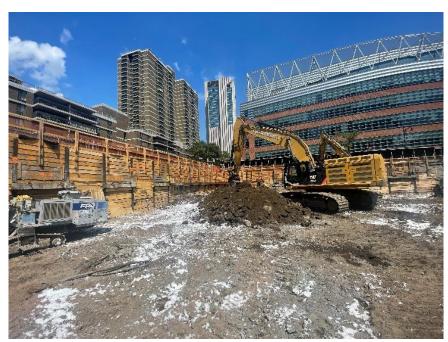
CCJV excavating non-hazardous soil/fill in the northern part of the site (facing northeast)
